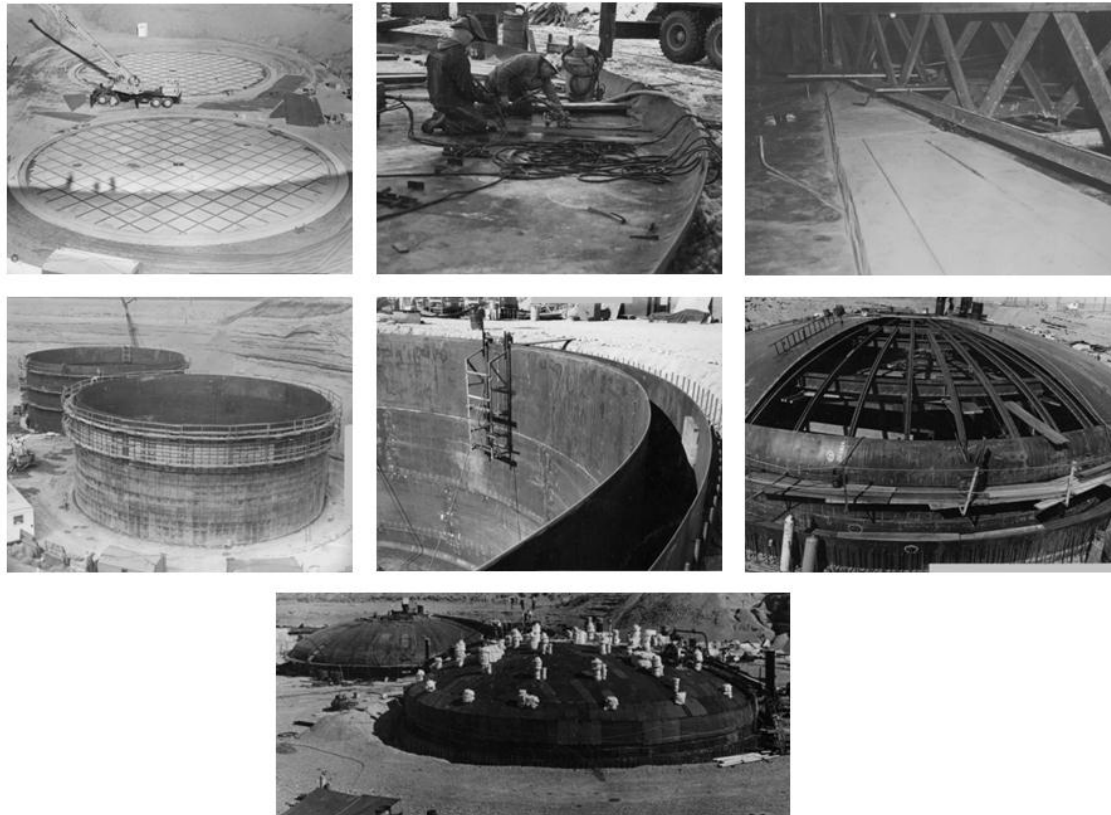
Tank AY-102 Construction Sequence: Left to Right from Top: Concrete Foundation, Tank AY-102 in Foreground; Secondary Liner Lower Knuckle Fabrication; Insulating Refractory Placement; Primary and Secondary Tank Steel Erection and Concrete Sidewall Shell; Backfill to Height of Secondary Tank Steel; Placement of Primary Tank Dome Plates; Preparation for Primary Tank Post-Weld Stress Relief.
